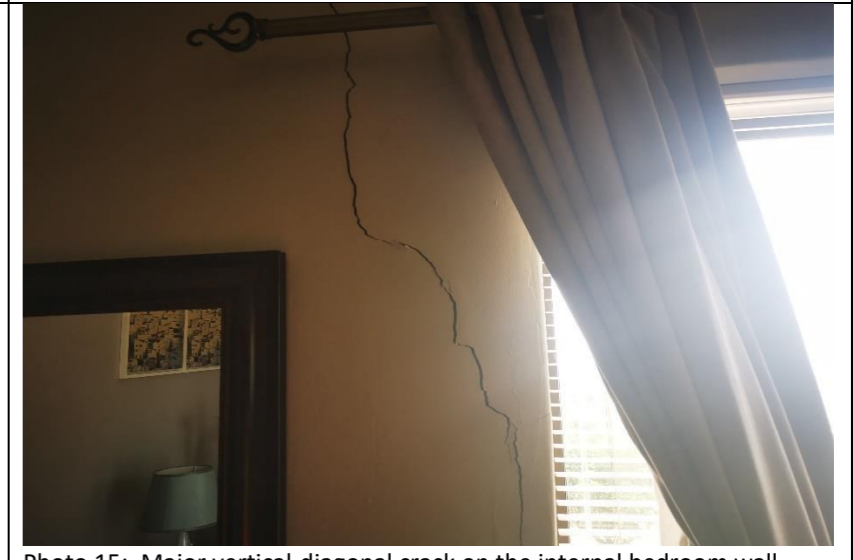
Major vertical-diagonal crack on the internal bedroom wall.
